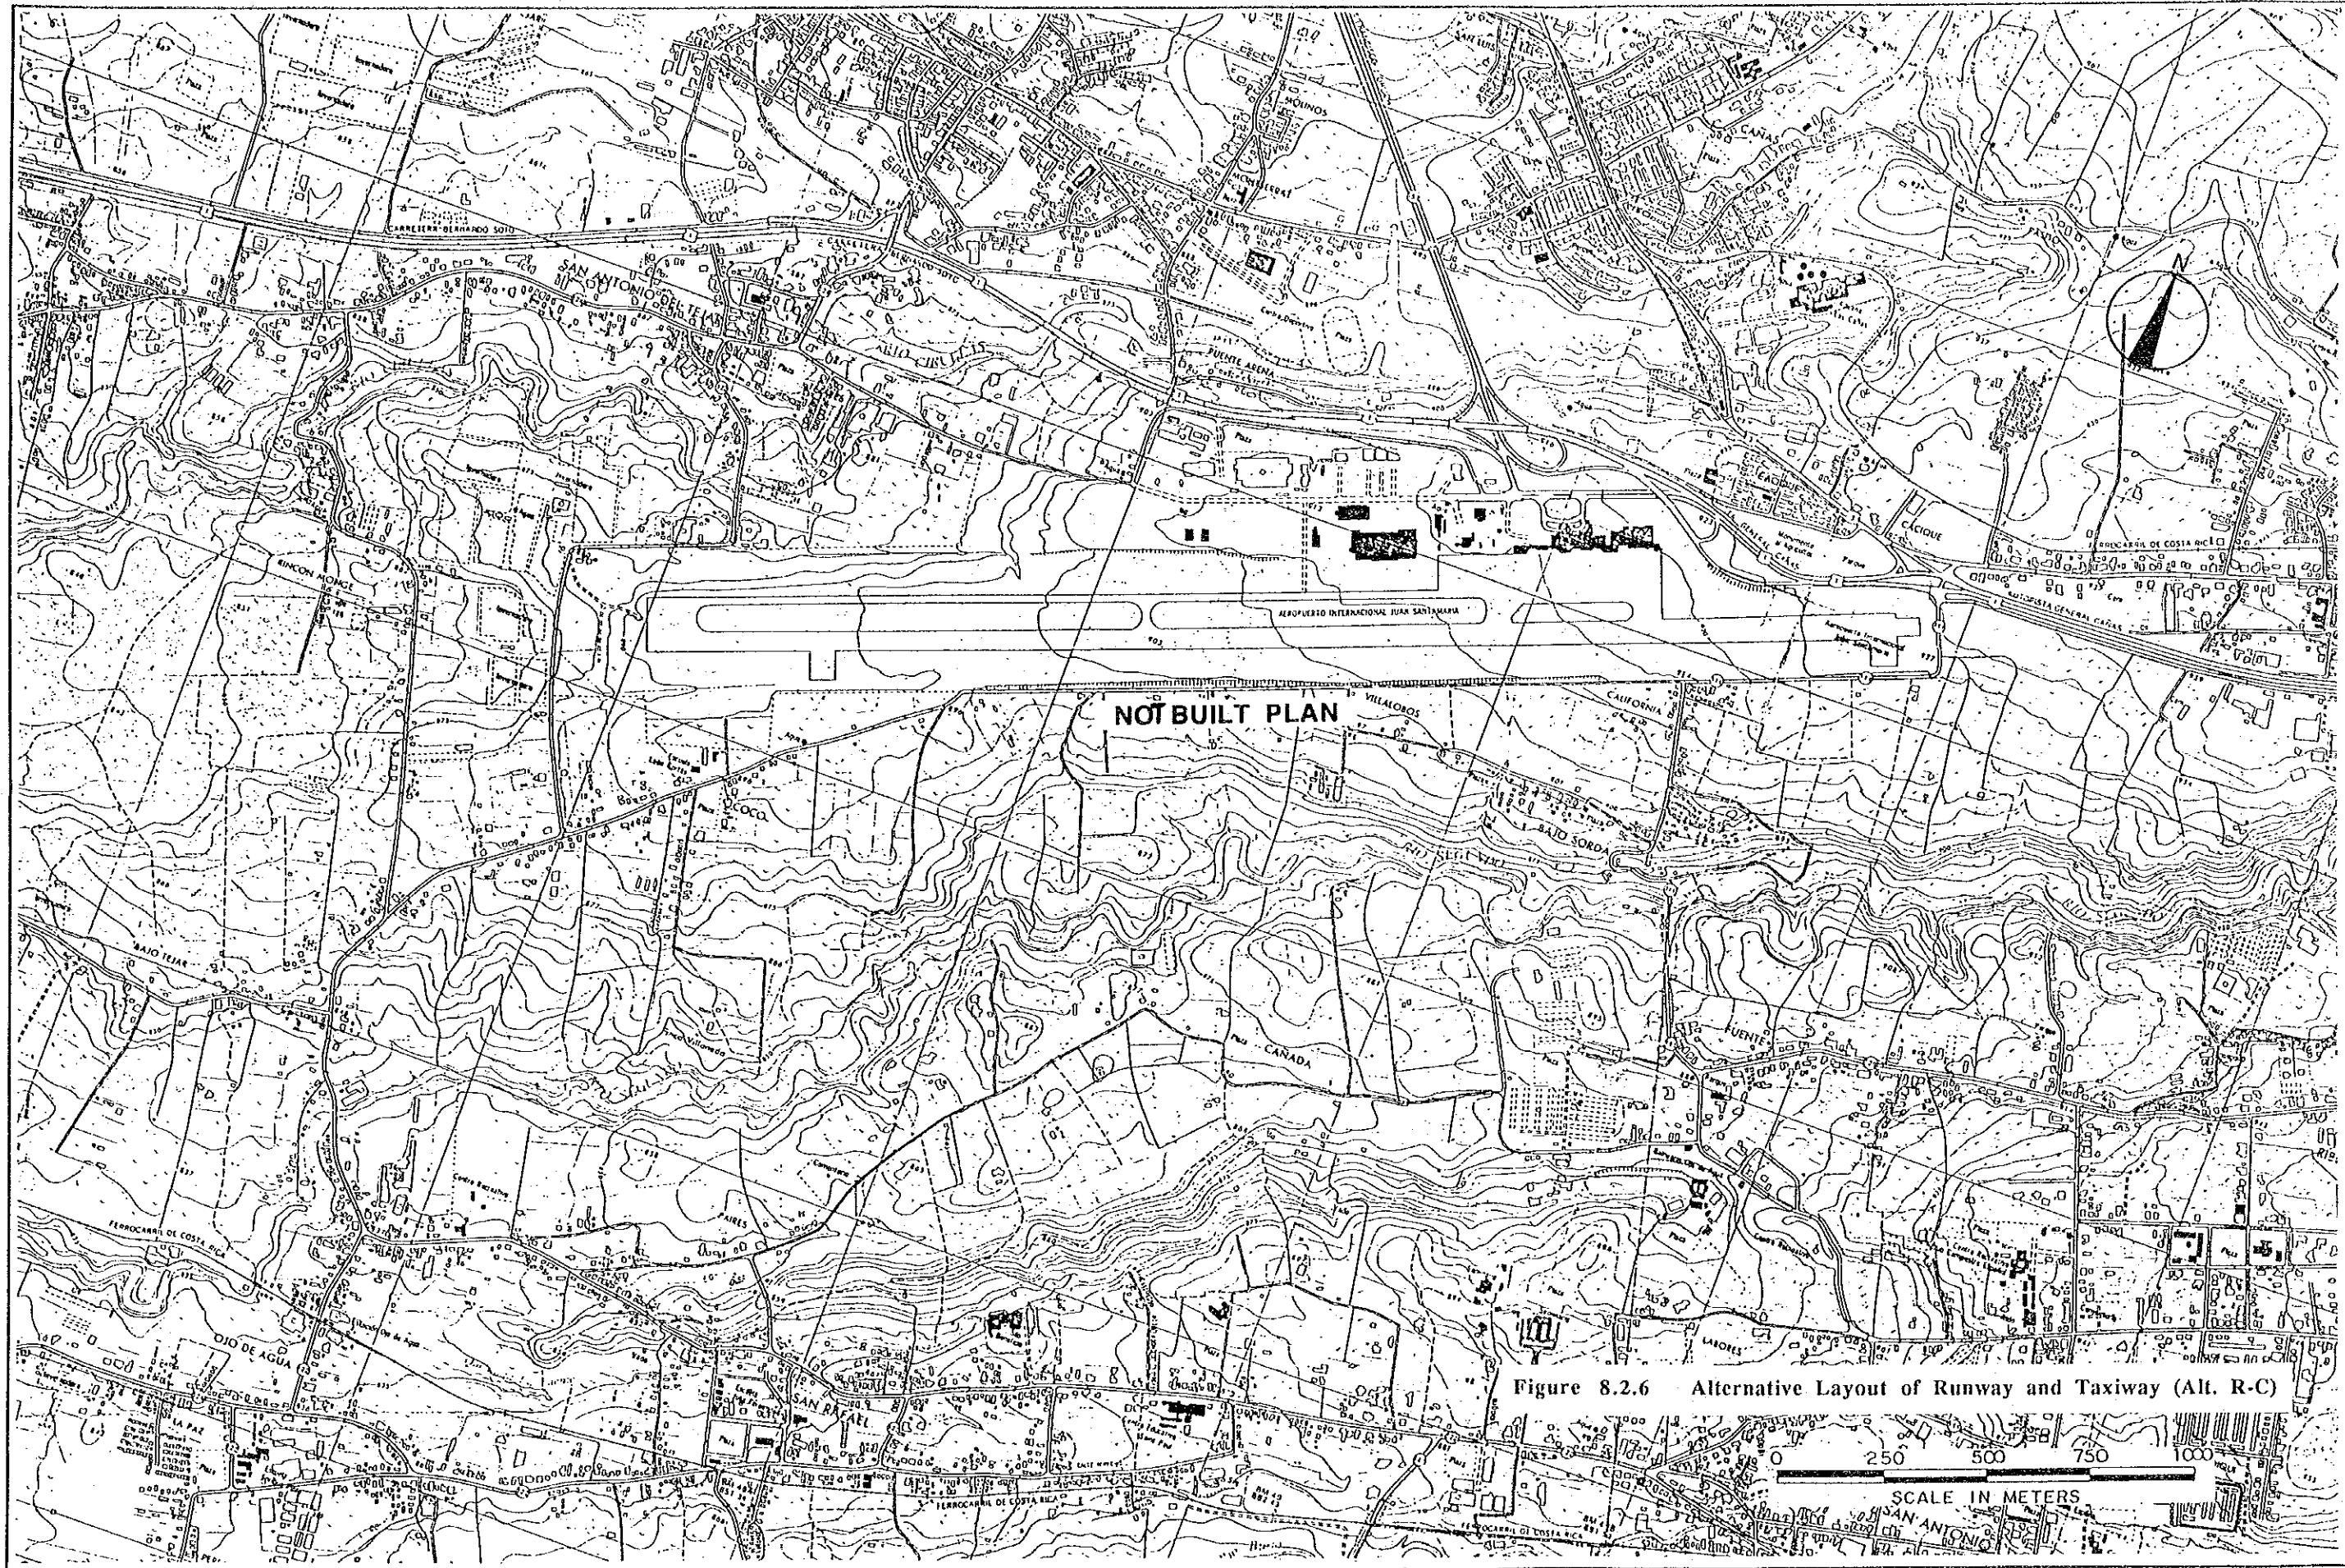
Alternative Layout of Runway and Taxiway (Alt. R-C)
